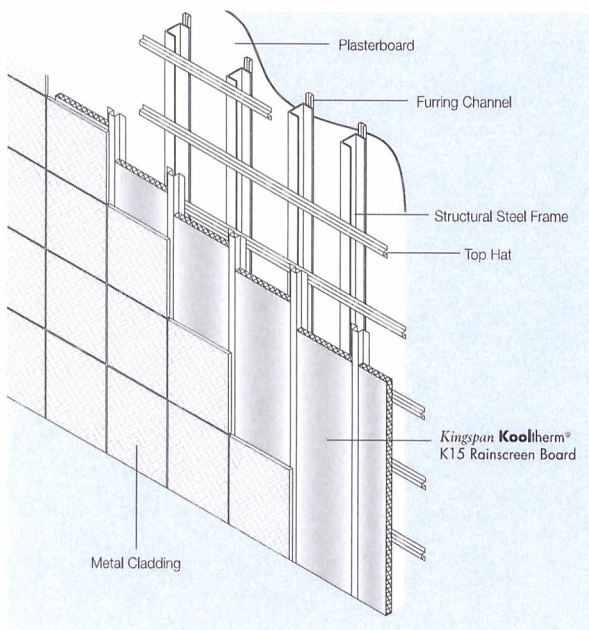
Alternative system example (metal clad steel-framed wall with Kingspan Kooltherm[®] K15 Rainscreen Board)
